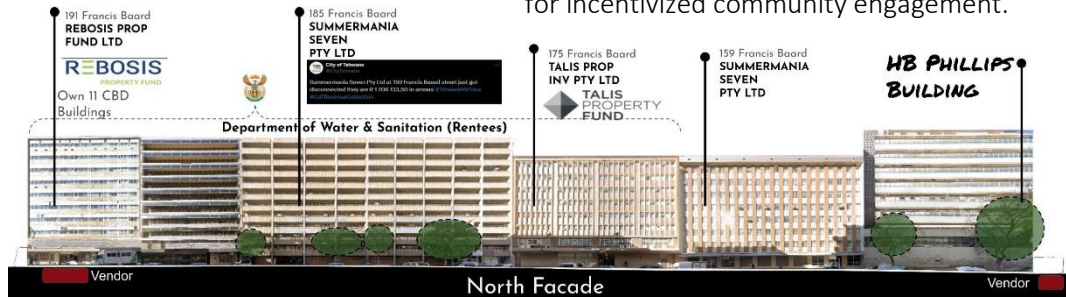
North Facade Street View Showing Building Ownership and Main Street Edge
